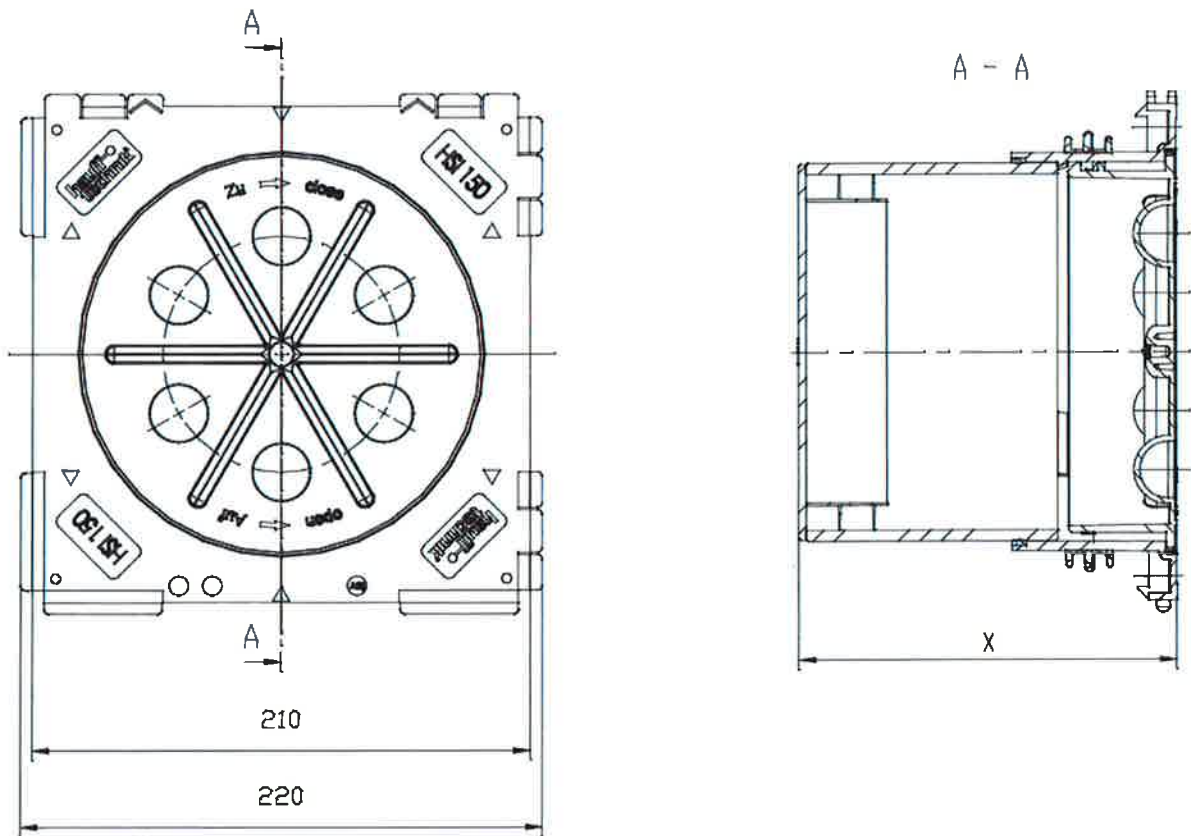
Detail of the single wall insert Hauff HSI150-K/150 - manufacturer's drawing.
